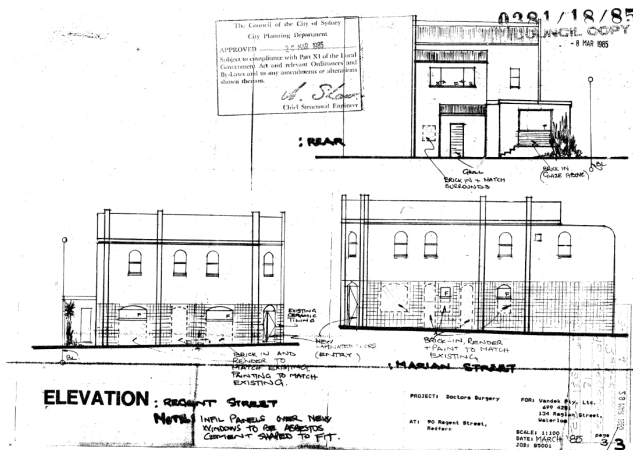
Plans depicting the proposed renovations to the building in 1985.⁷⁹
